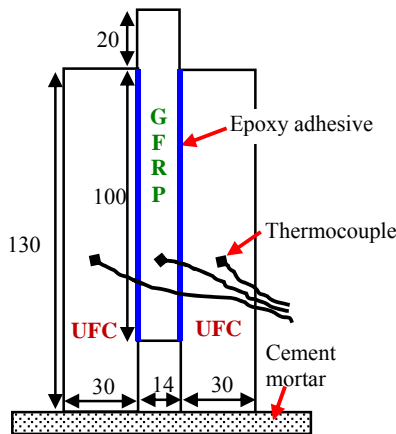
Cross-sectional details of epoxy adhesive lap-shear test specimen (Units: mm)
